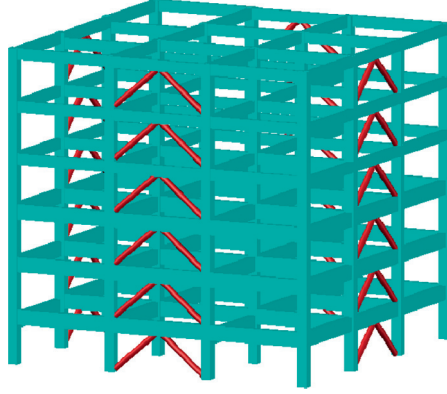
3D view of the reinforced concrete building with BRBs (model RC-BRB6).
